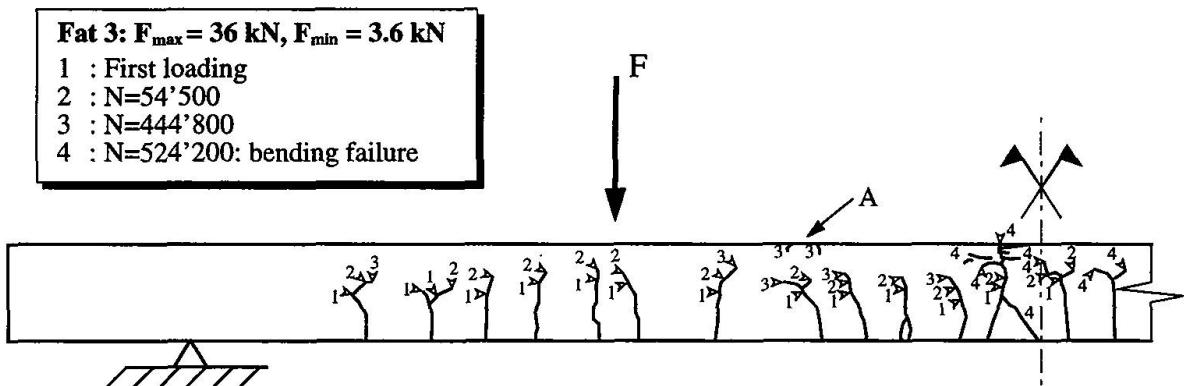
Crack pattern of a specimen with 1.37% reinforcement as observed by visual inspection.
